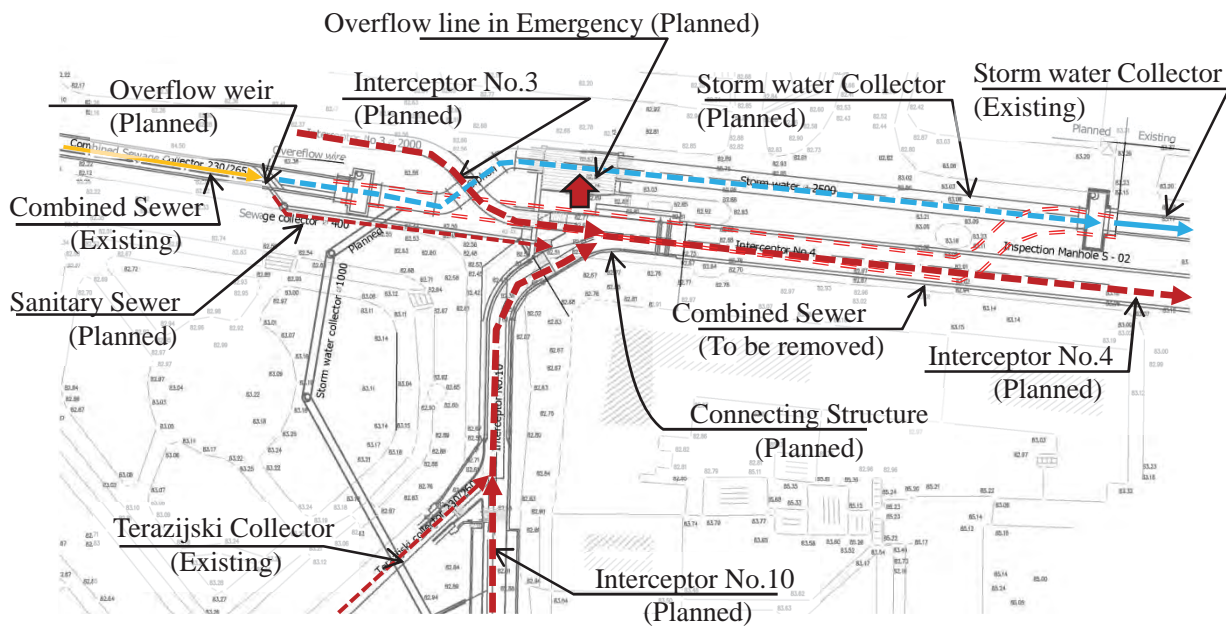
Layout Plan of the Connecting Structure at the Begging of Interceptor No. 4
